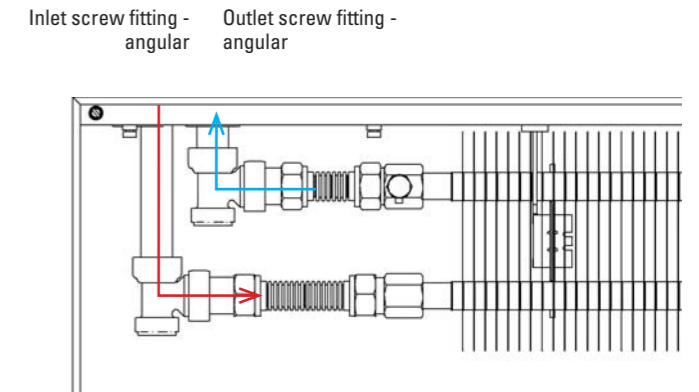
Side heating water connection - in the room (non-standard accessory - angular connection).
